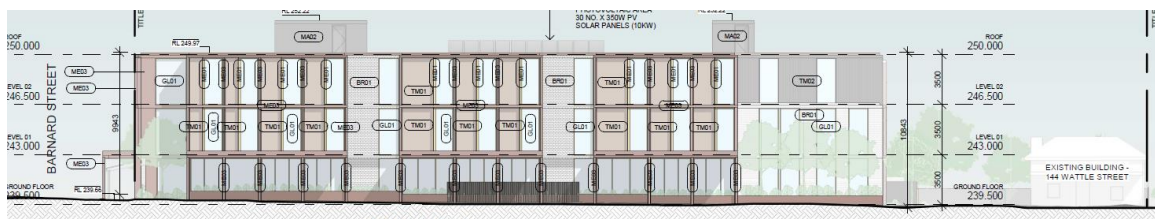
Wattle Street elevation. Retained building at 144 Wattle Street visible to right. Source: Life Architecture, 2026.
